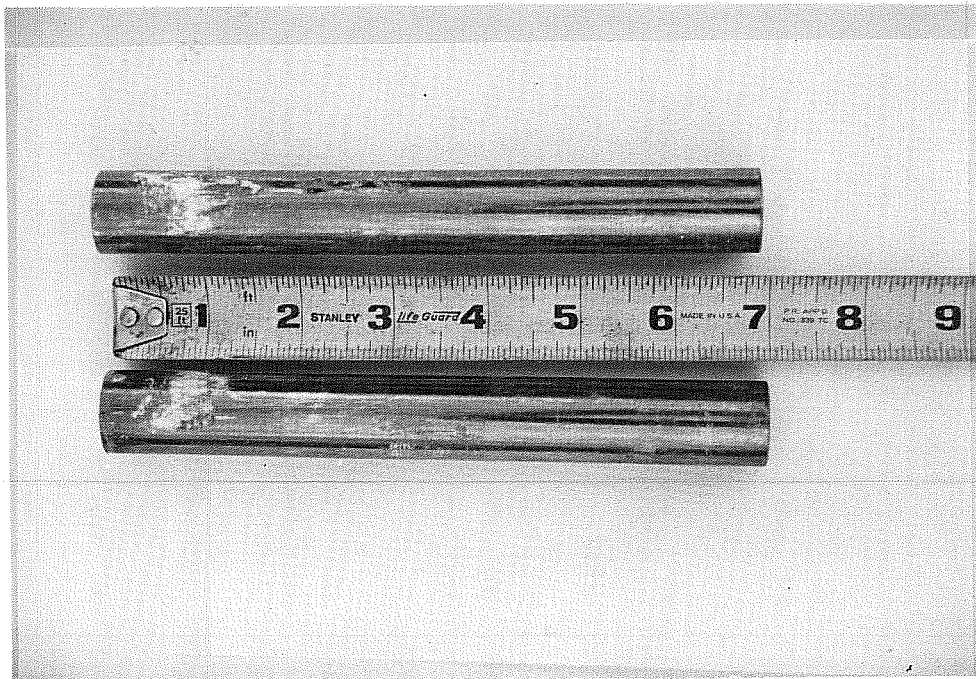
Typical Surface Spalling for Undercut Anchors
